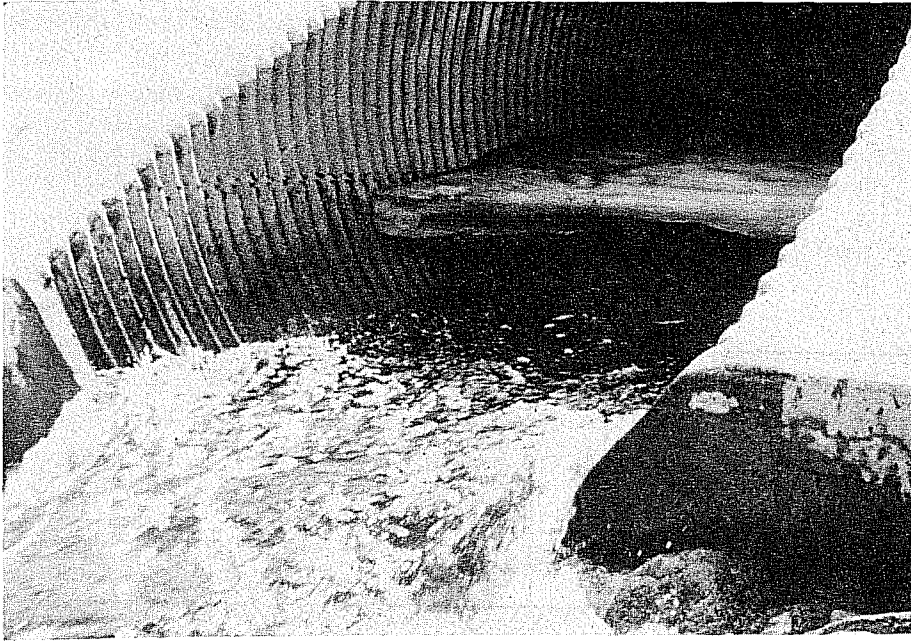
Icing at outlet of west (offset) culvert, May 15, 1974
